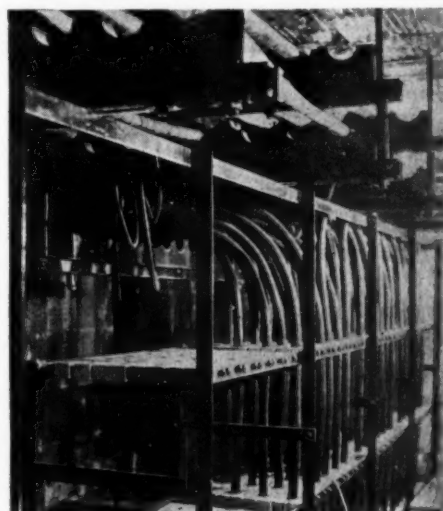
Details of cable supports in pull box over main switchboard in the basement
